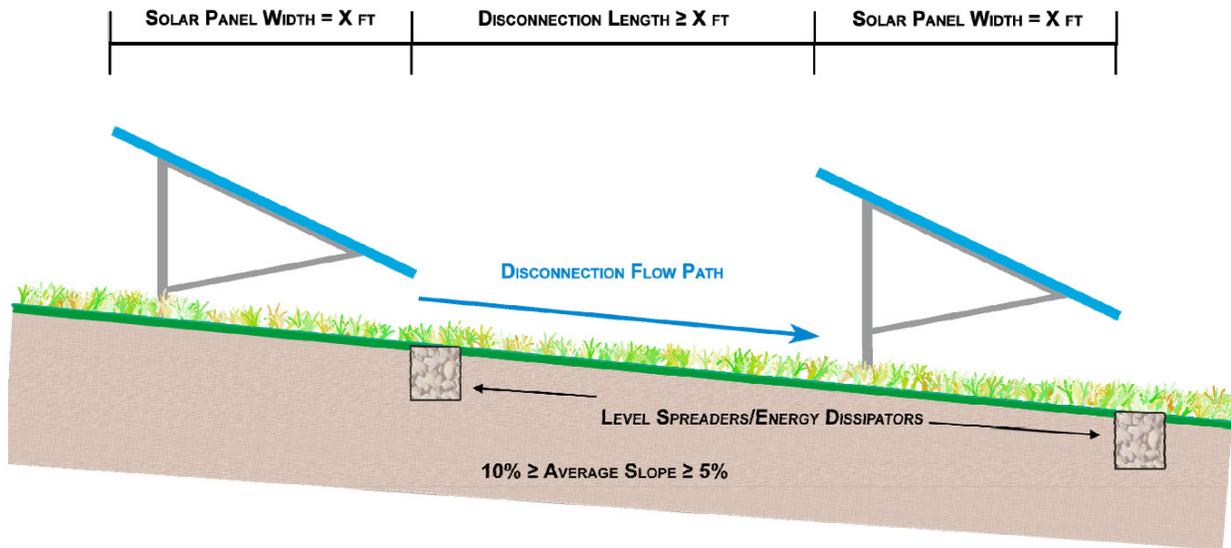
Recommended row spacing and sheetflow structures for maintaining natural hydrology (MDE 2013).
